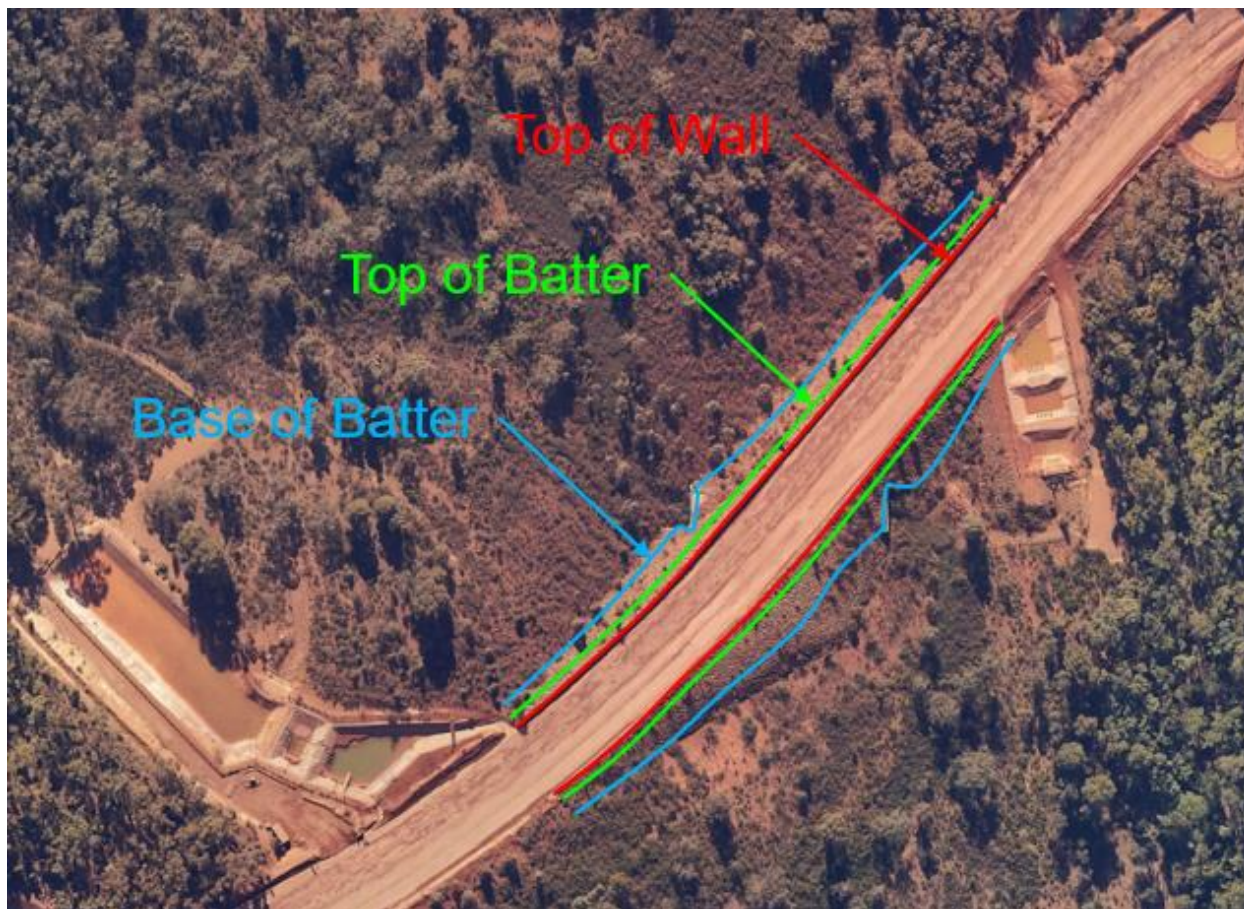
Approximate extent of proposed causeway barrier upgrade
